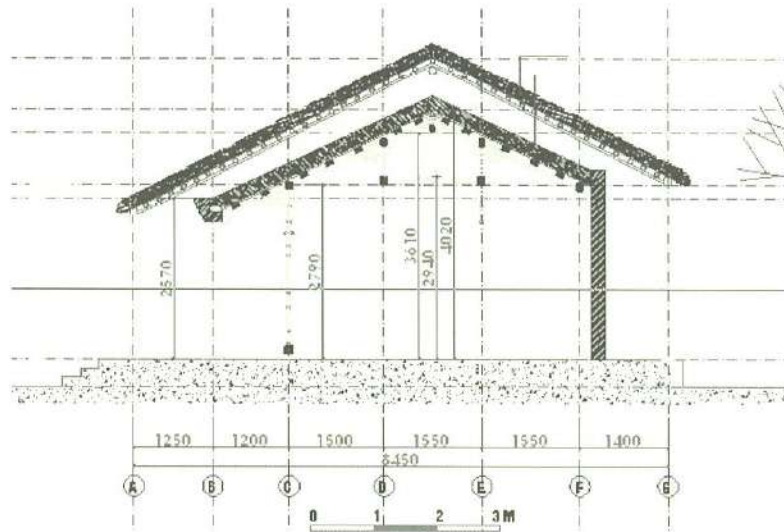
Wooden structure of a Kinh traditional house in Binh Dinh province (Vinaculto)
